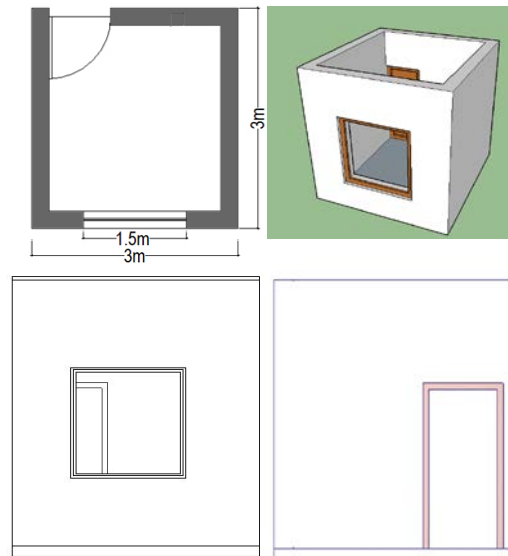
a) Plan, b) View, c) Front Elevation & d) Rear Elevation of case -I
